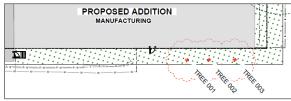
(2)-1: Trees 1-3 from Sheet C007
